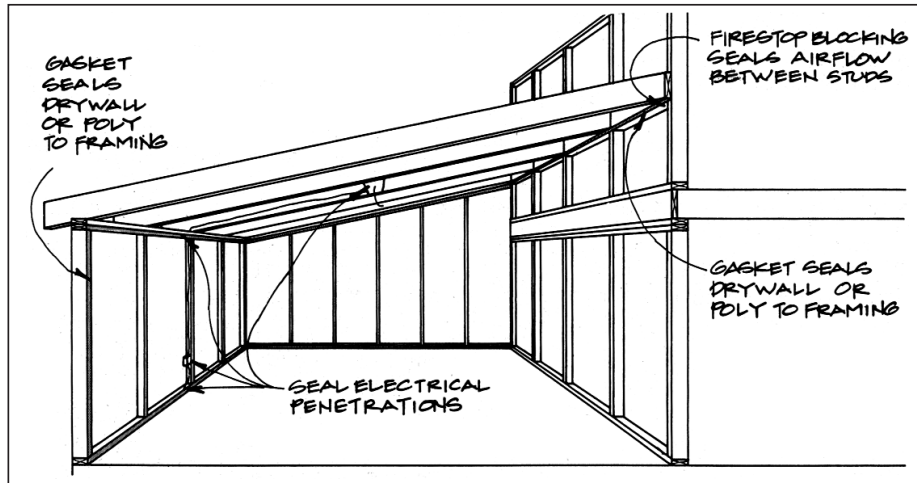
An "airtight drywall system" keeps excess moisture from moving up into the cathedral ceiling cavity. Crucial to the system is meticulous taping, sealing of all openings, and a gasket at the ceiling/wall intersection.
